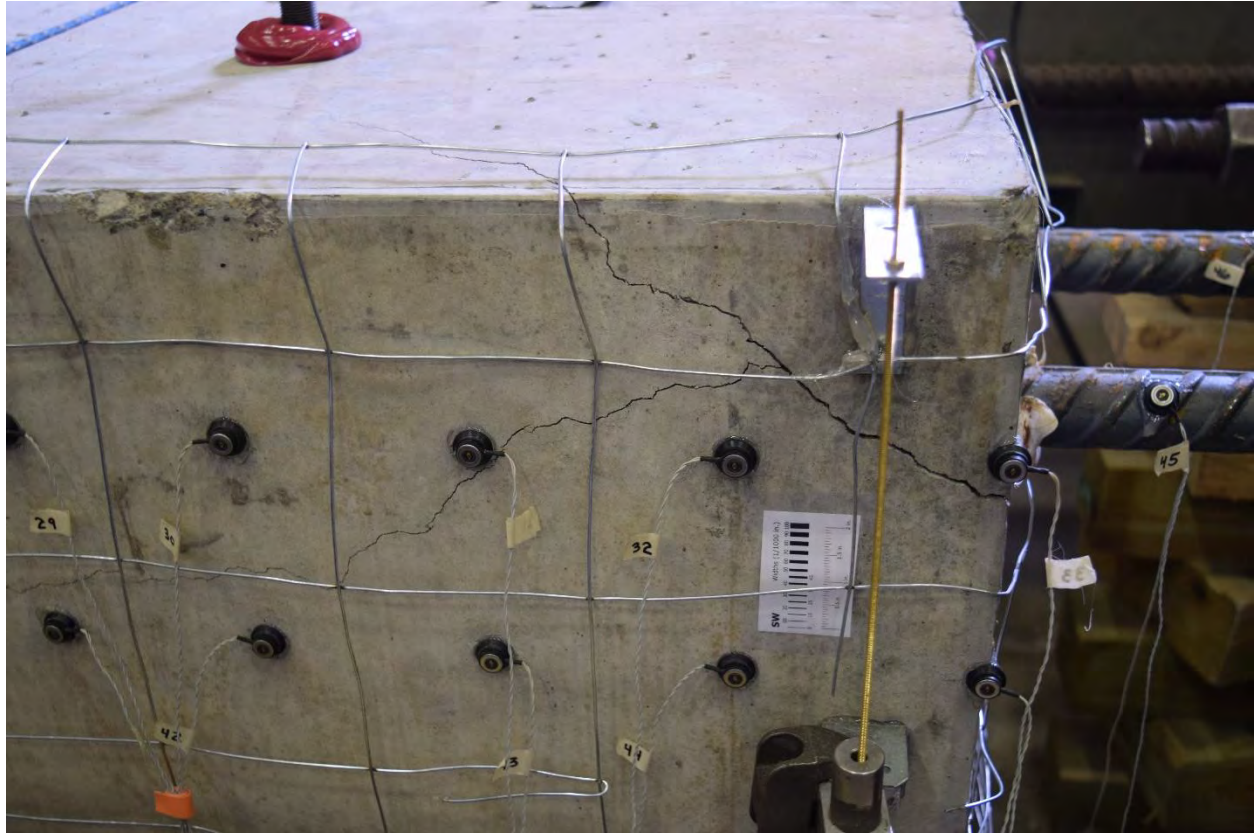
Test Photo Specimen D7, SW corner, 110 kips
